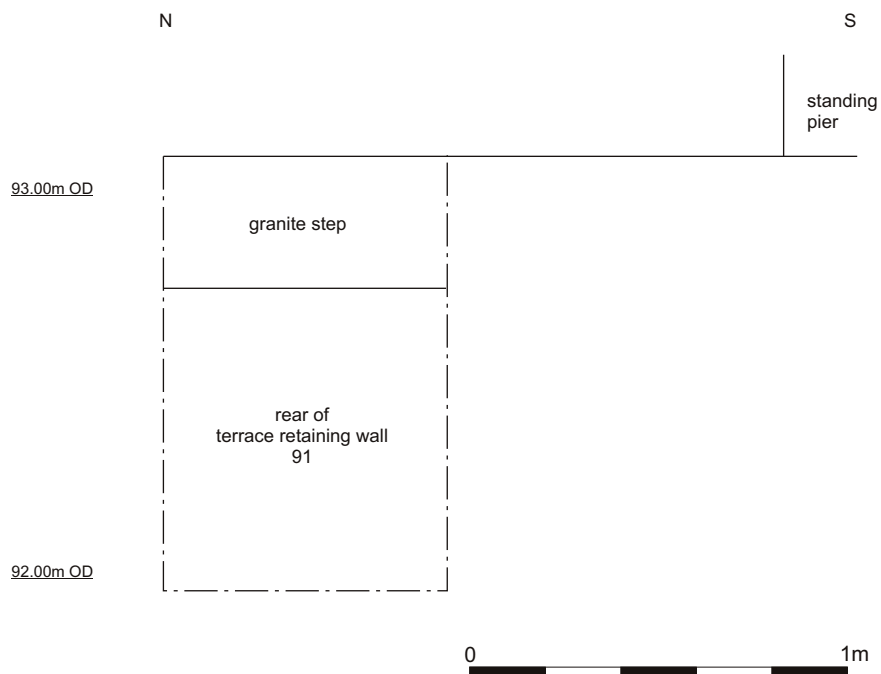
Test pit 7 , elevation of part of terrace retaining wall
